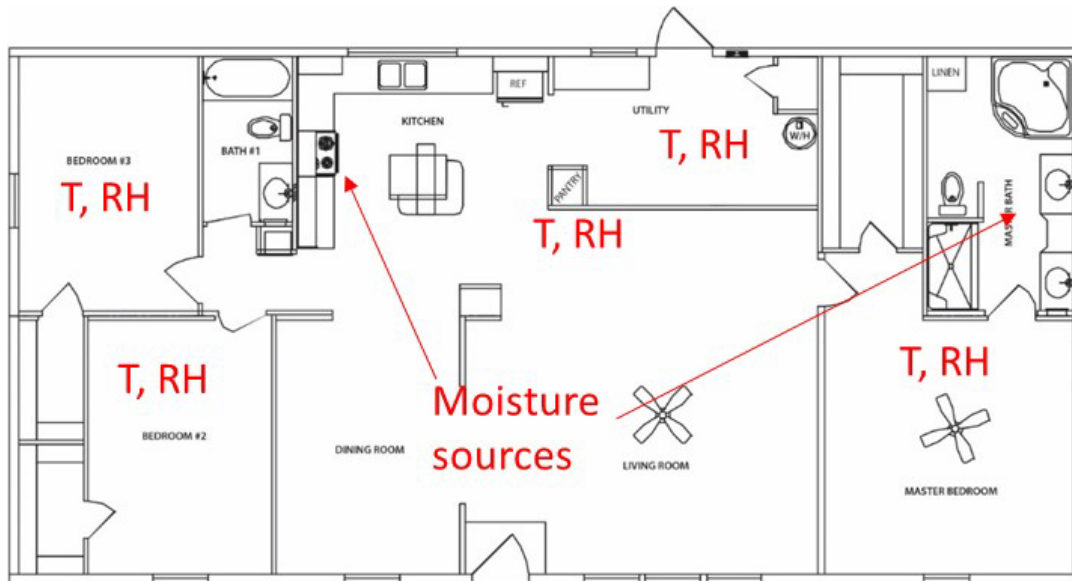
MH Lab floor plan showing location of internal moisture sources and indoor T/RH measurements.
